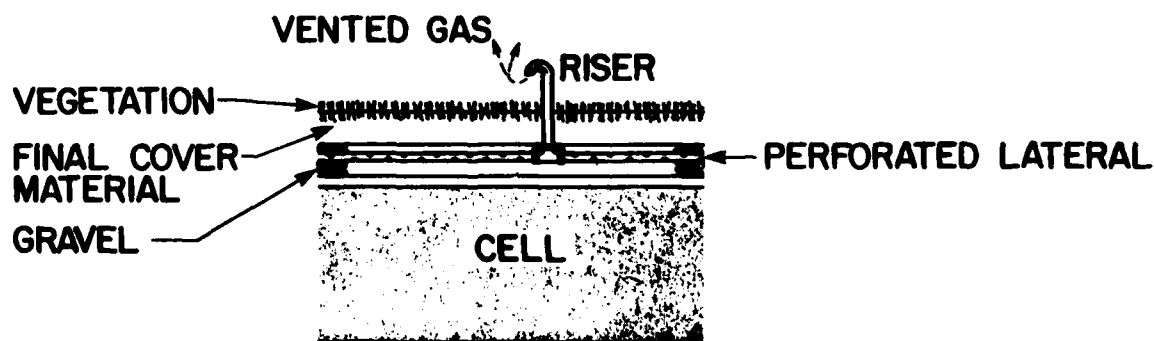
Pipe vent with connecting laterals in shallow gravel trenches above the waste. (From D. R. Brunner and D. J. Keller, *Sanitary Landfill Design and Operation*, Environmental Protection Publication SW-651S [USEPA, 1971].)
